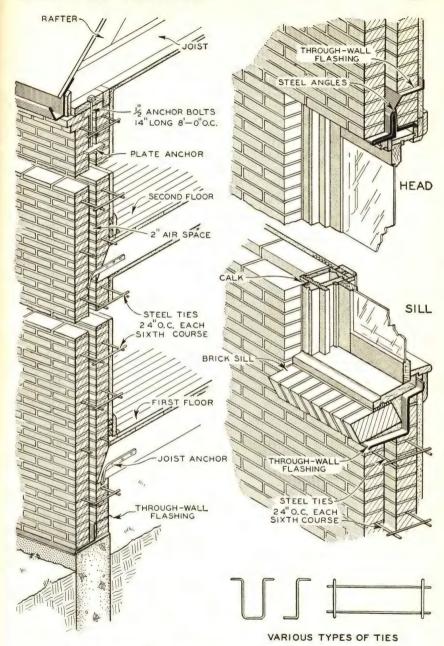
Pictorial View and Details of Ten-Inch Cavity Brick Wall
